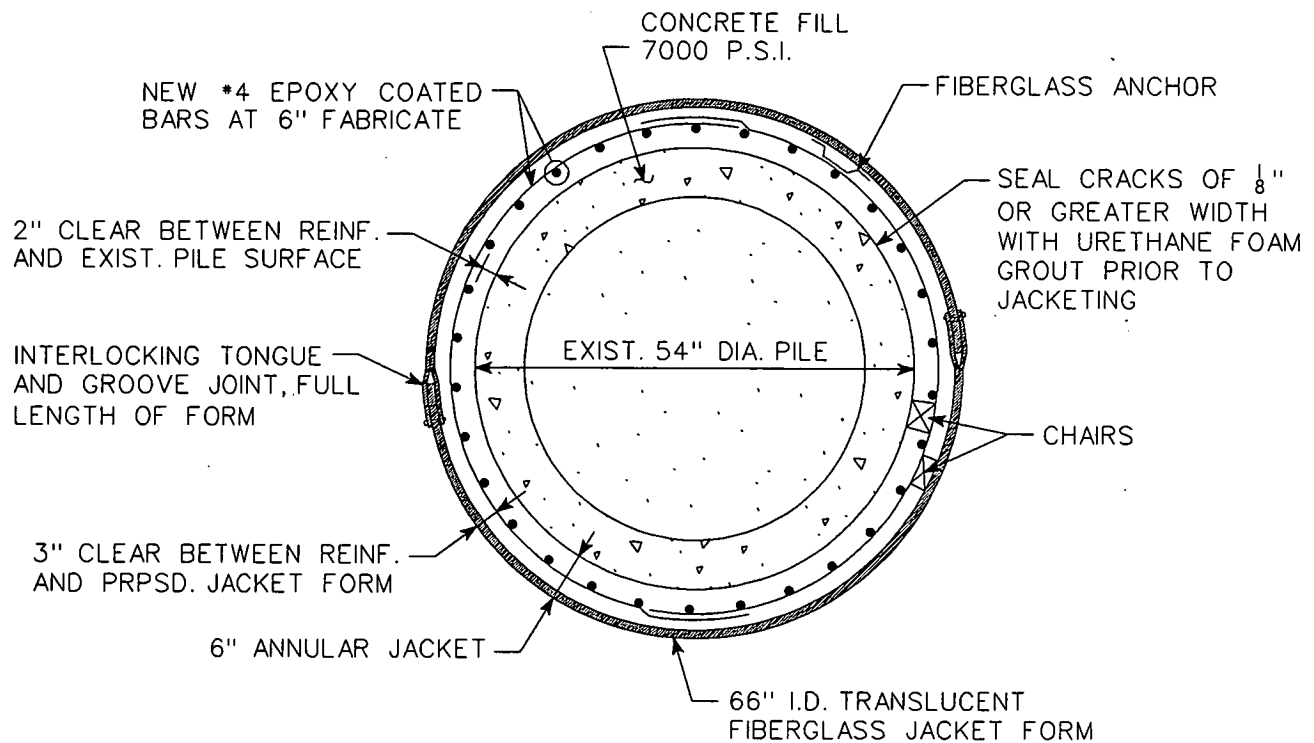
Hollow prestressed concrete pile repaired with tubular concrete jacket with translucent permanent fiberglass form (after 25).
